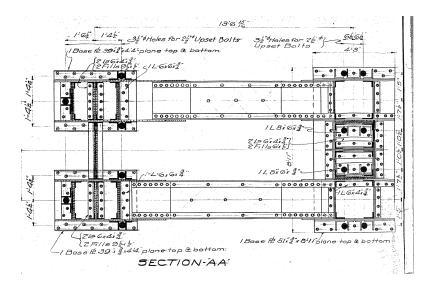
Burnside Bridge Piers 2 & 3, Bascule Piers Wall without proper seismic reinforcing detailing, potential lost of axial support in seismic event
